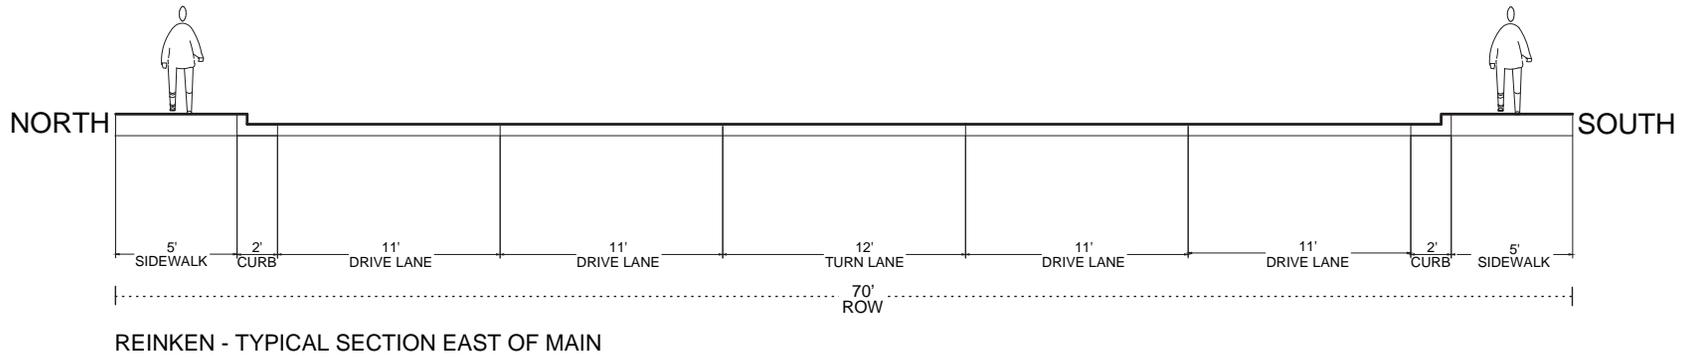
EXISTING ROADWAY SECTIONS, REINKEN
